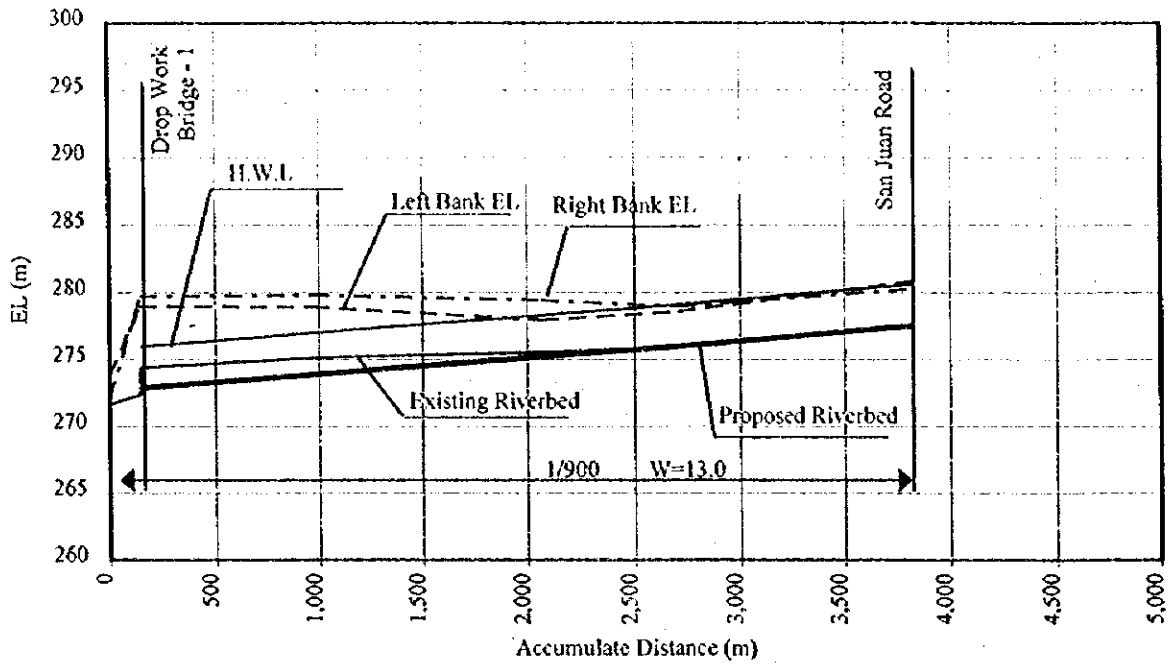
(2) LONGITUDINAL PROFILE OF DRAINAGE IMPROVEMENT
